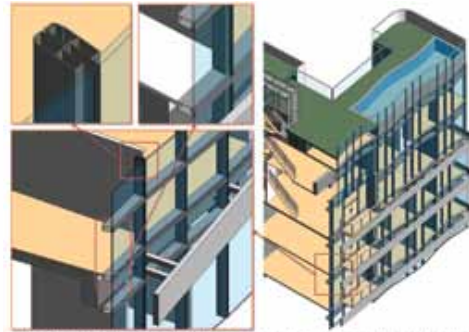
The window wall being modeled for the detail level for building's facade design, including architectural and facade design details to coordinate the actual design and construction.
